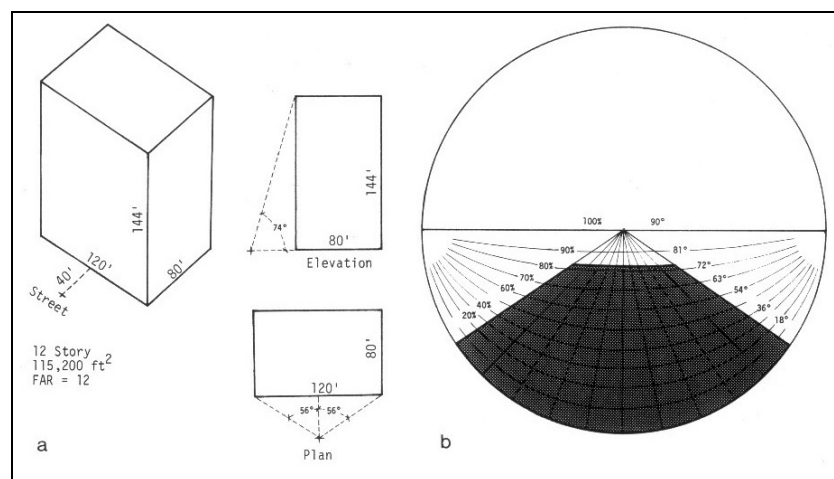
The Forming the Building to Daylight Conditions for Solid Building
